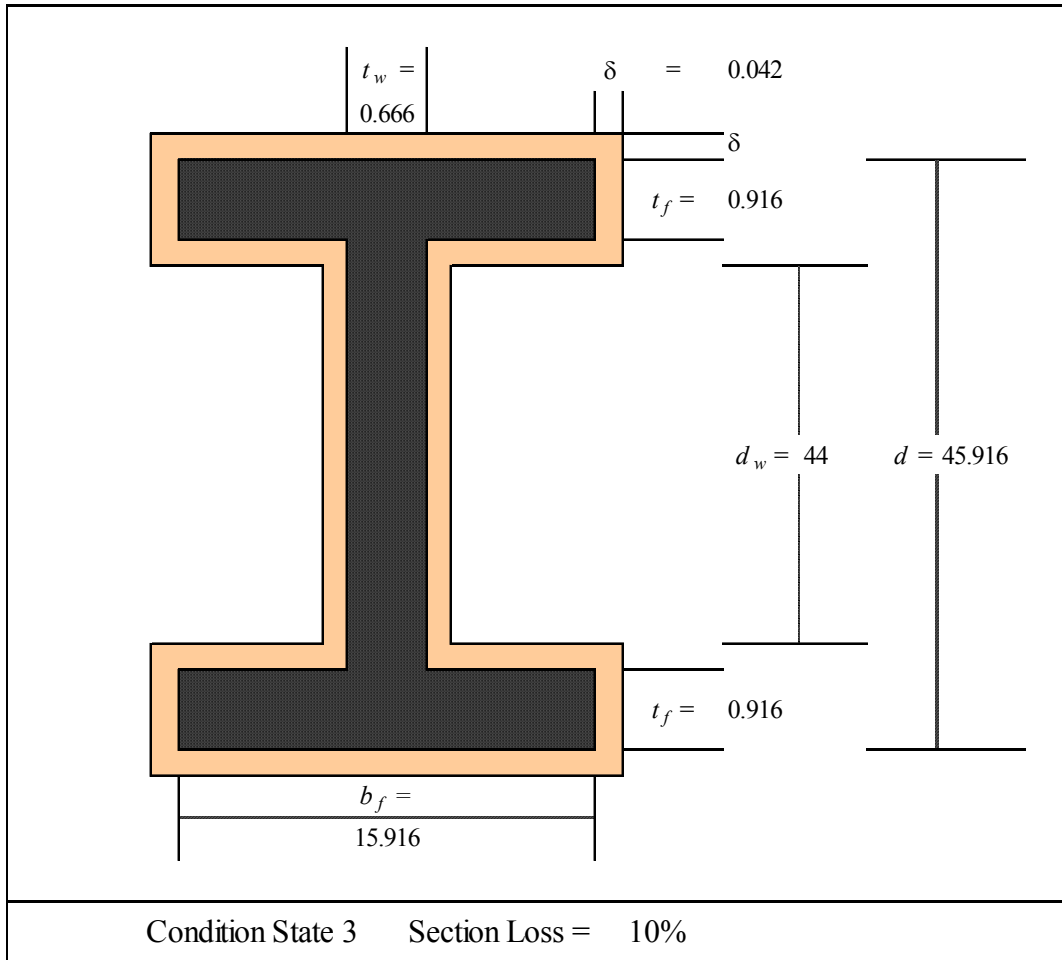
Dimensions of Steel Girder Cross-Section in Condition State 3
